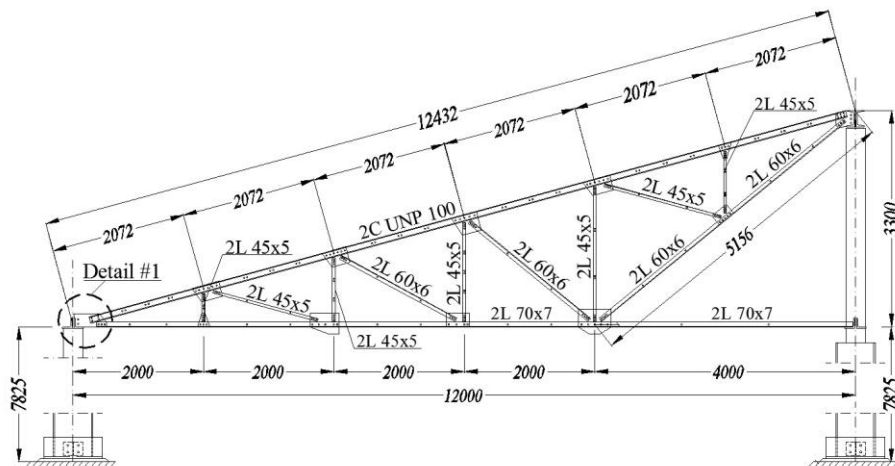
Single-bay structural cross-sections of trusses in direction *X*.
